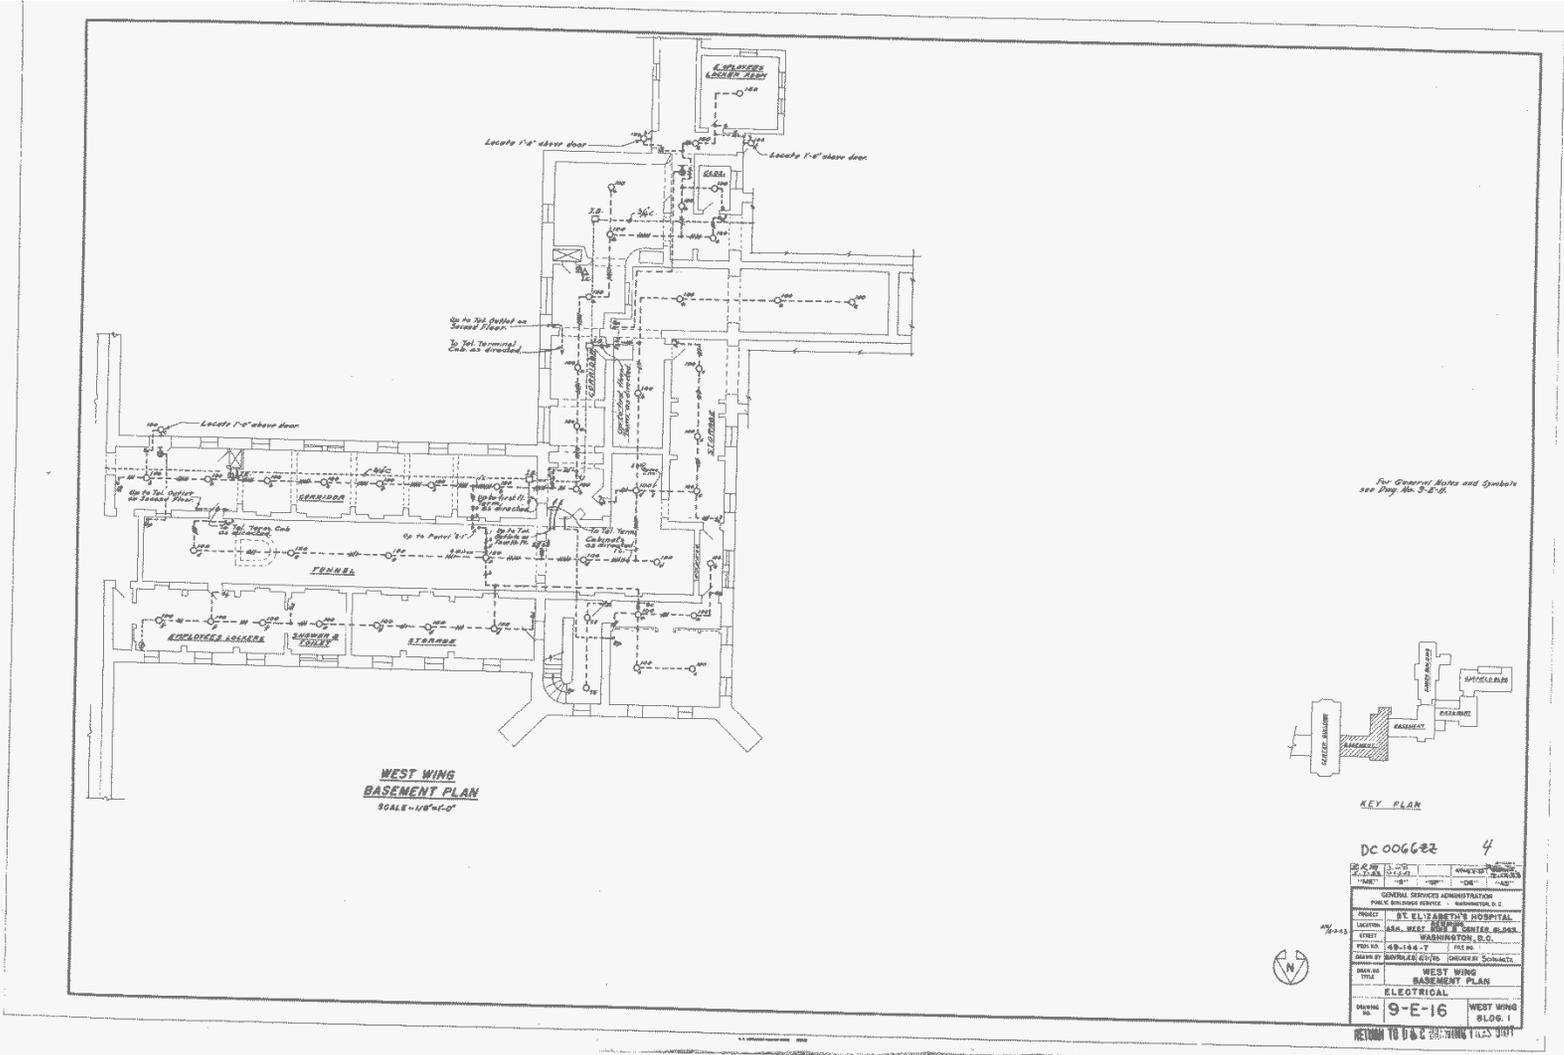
Basement plan of the west wing of the Center Building outlining improvements to the electrical system, 1953. Source: GSA archives, image DC0066SE0004.
